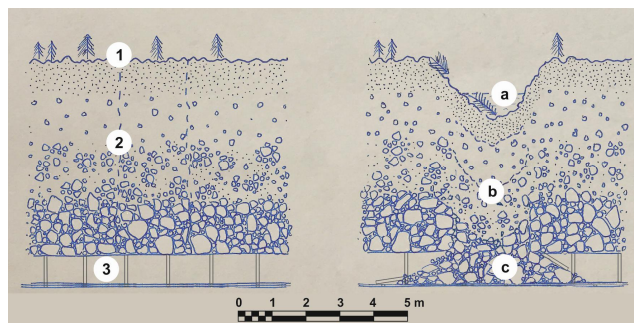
Pingens created by a sudden (catastrophic) collapse of the overburden. Legend: 1. natural relief, 2. overburden layers, 3. mining underground, a. Collapse pingens, b. Collapsed overburden, c. mining collapse.
